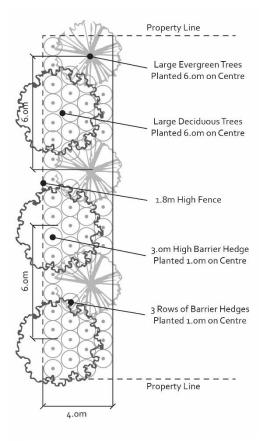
Example of vegetated buffer landscape plan for 4 m width, adjust plantings to accommodate 6 m or 8 m vegetated buffer width.
